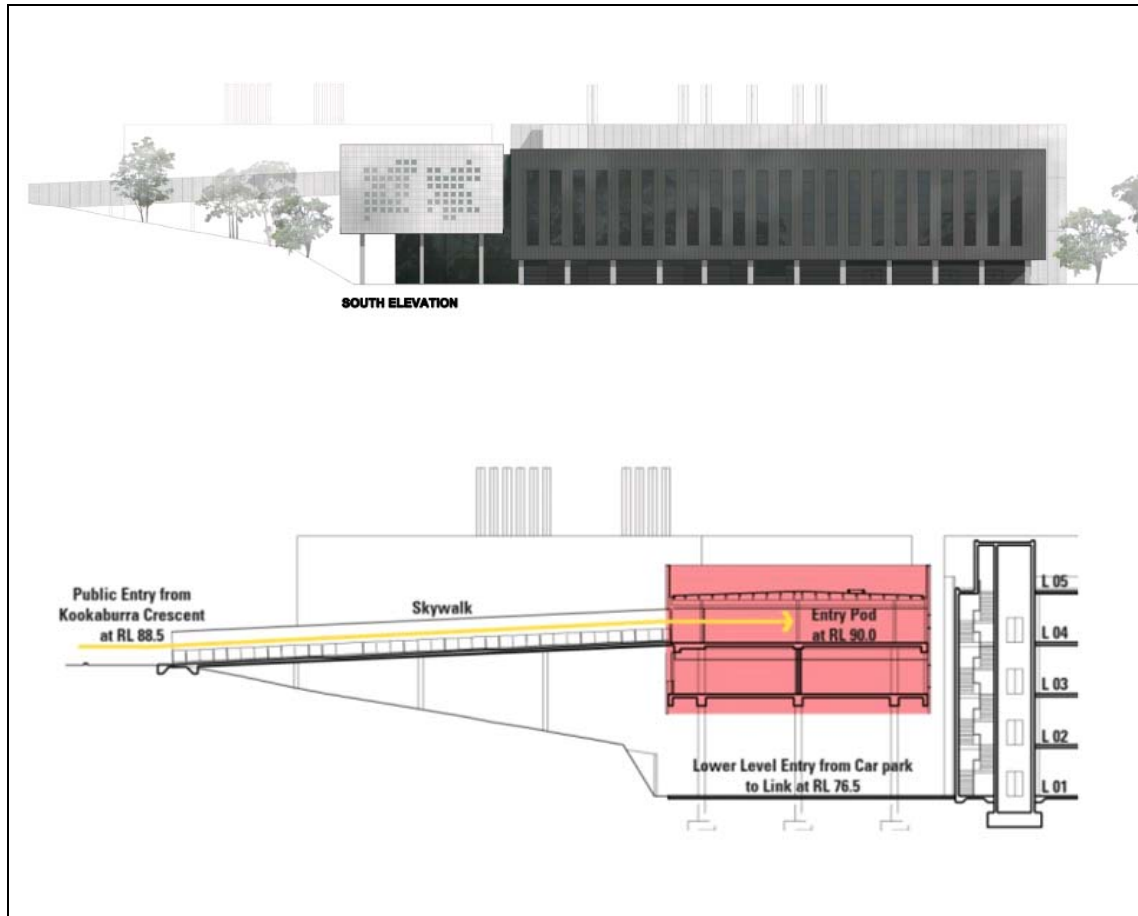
Elevation and section of the Entry Pod as viewed from the proposed car park.
